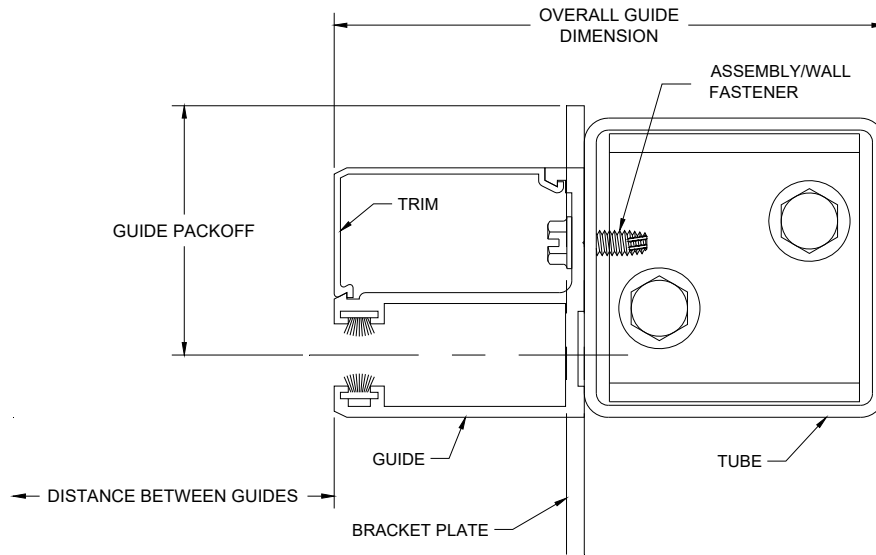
Face of Wall “E” Guide Mounting to Tube
